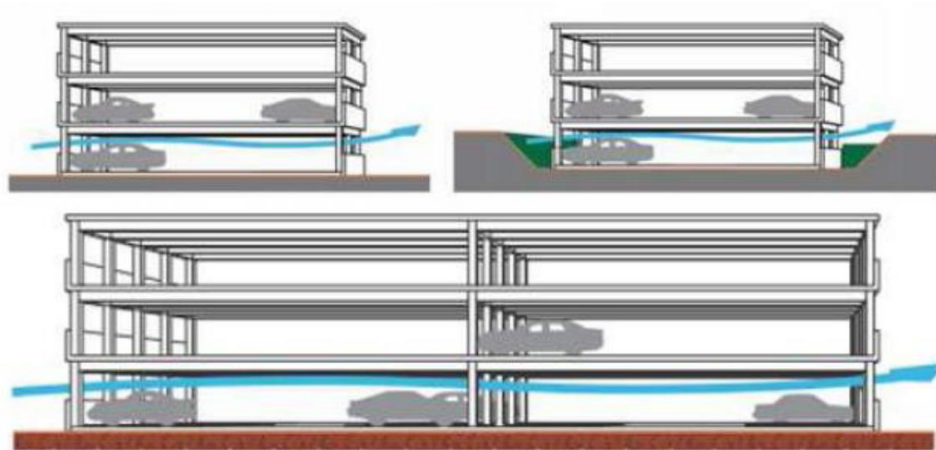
Design of a typical open car parking structure (ArcelorMittal, 2007)
